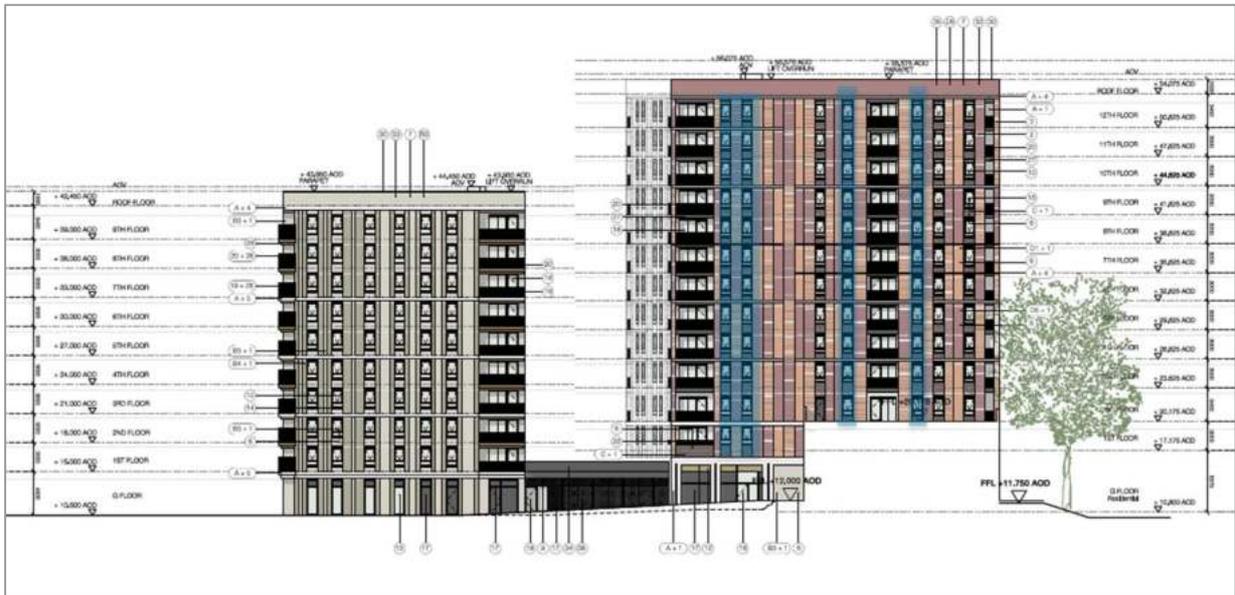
Block C1, east elevation. Windows that require blinds are marked up in blue (Patel Taylor drawings 23.10.2020).
